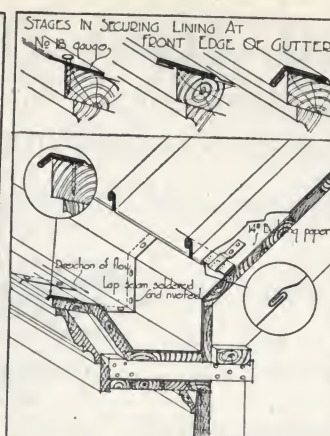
Details a Typical Box Gutter in Connection with a Standing Seam Galvanized Iron Roof
